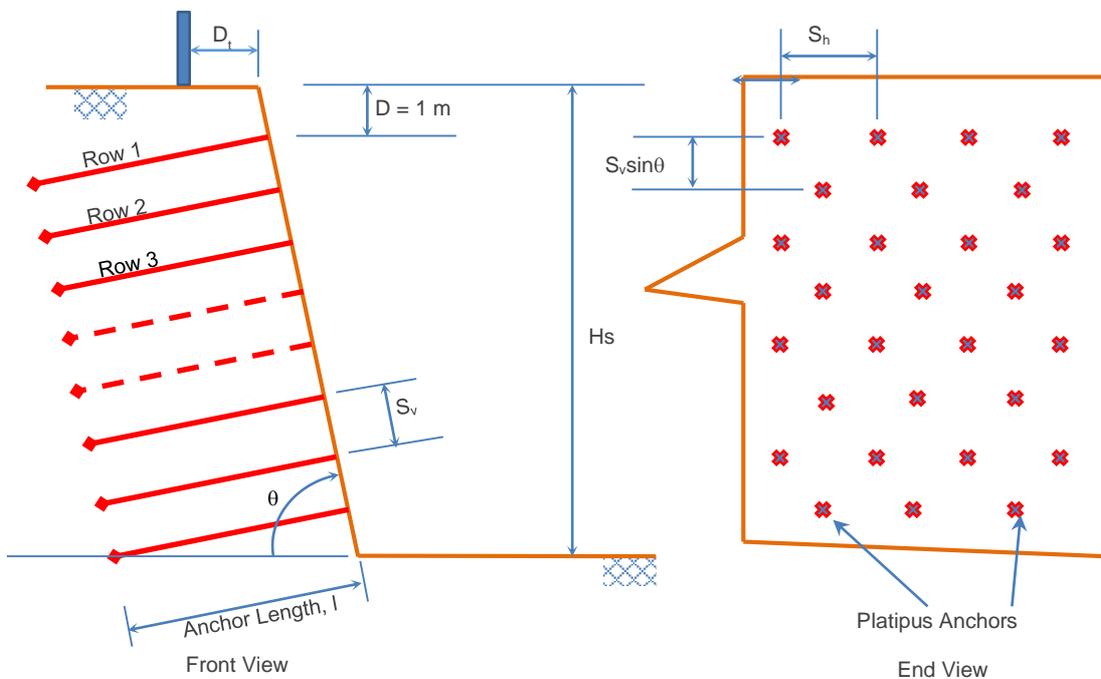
Typical Platipus Anchor Layout in a Temporary Slope
